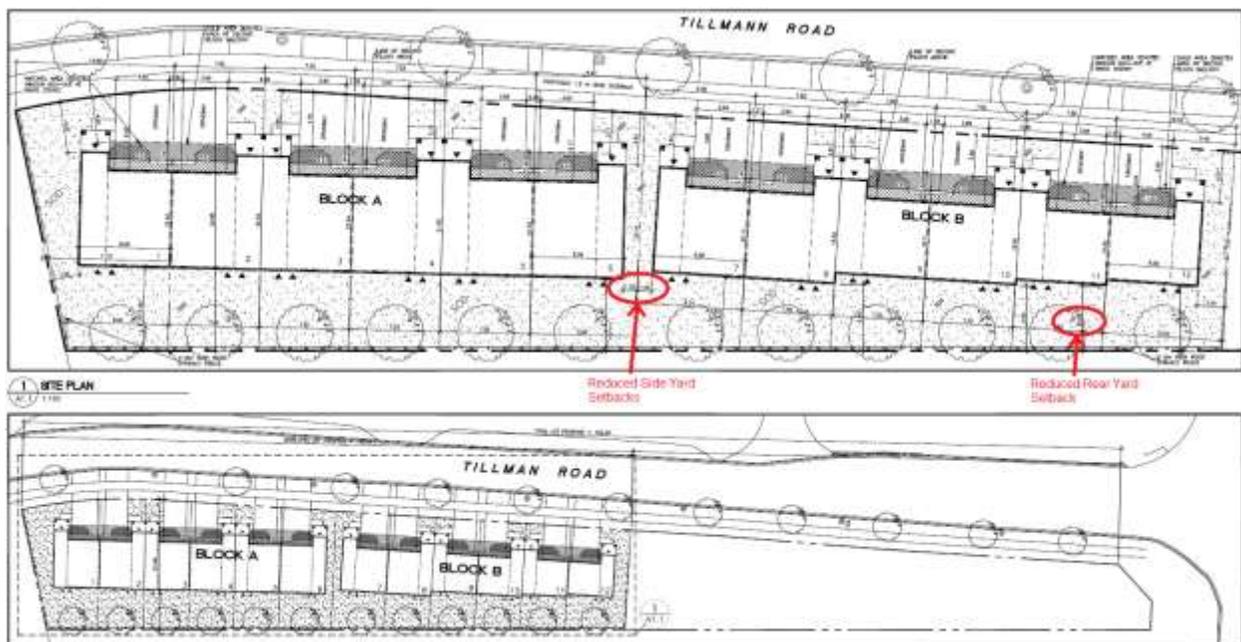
Conceptual Site Plan Showing Proposed Setback Reductions
